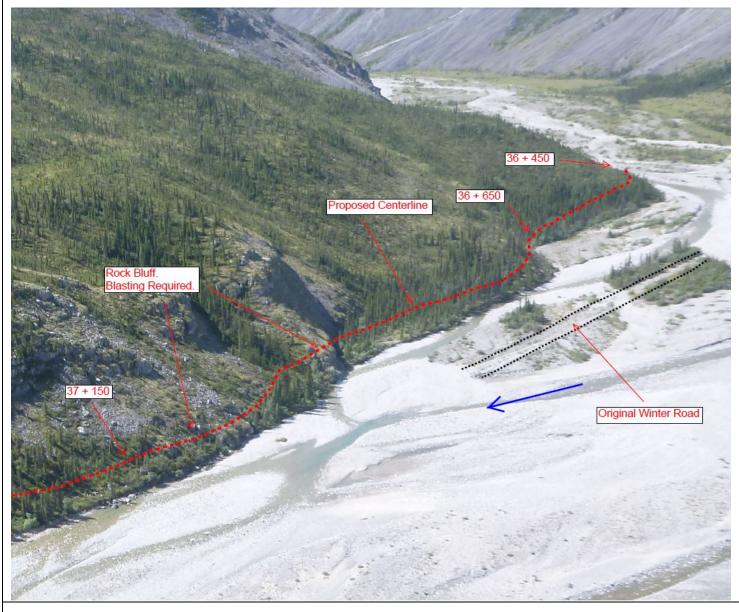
Aerial view looking southwest from KP 36+450 to 37+500.
